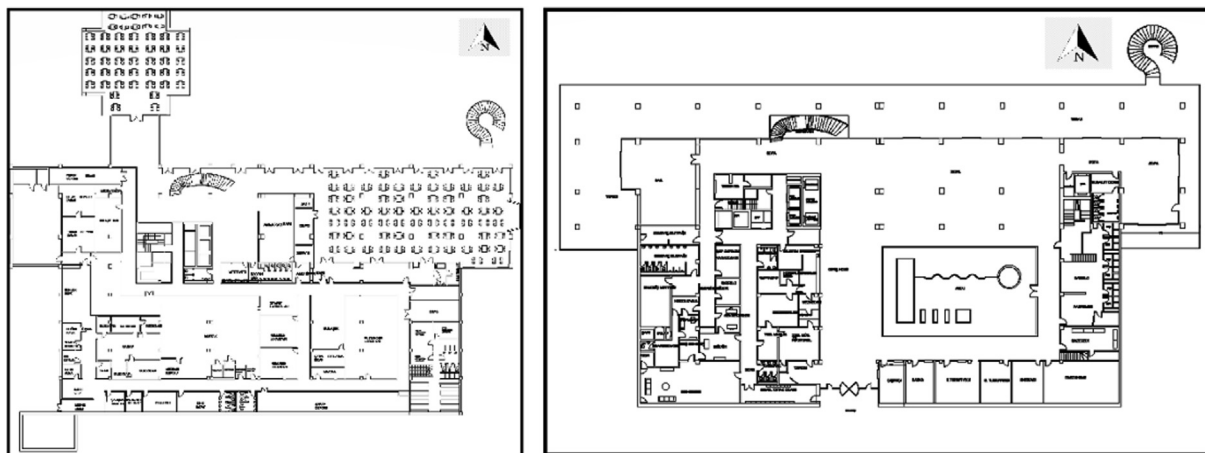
First basement floor plan and lobby floor plan of Hilton Hotel.
